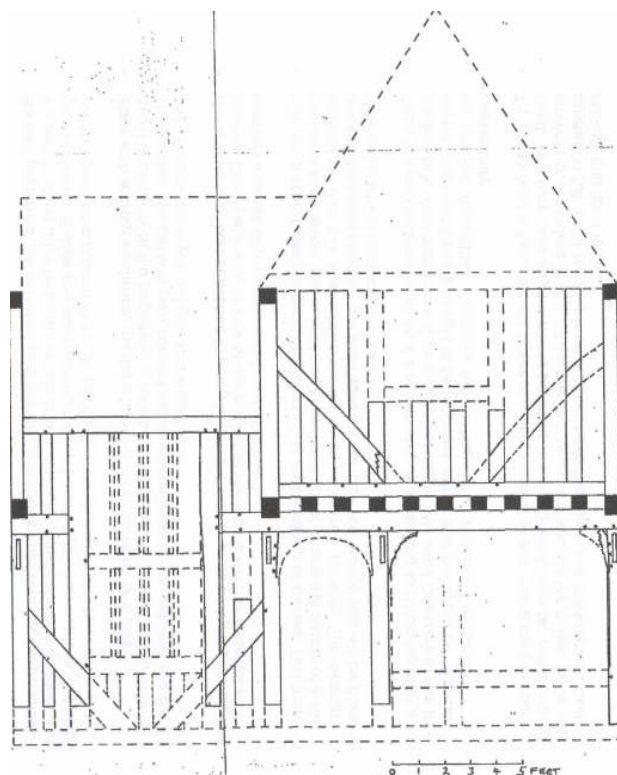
, Craig- Dhu, Church Street, Coggeshall plan of house as originally built
